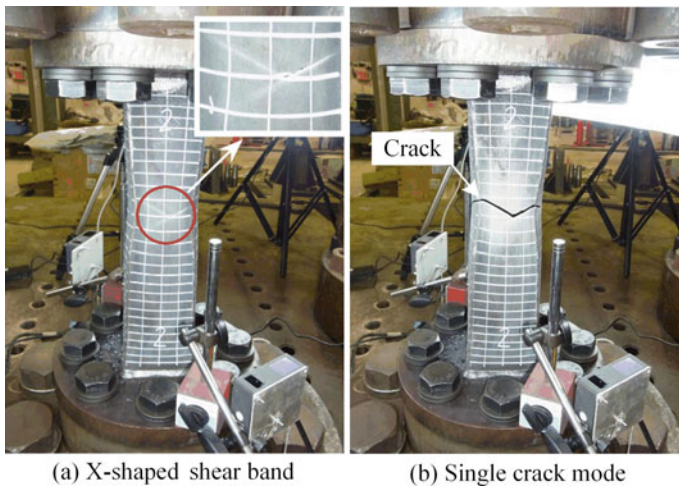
Formation of shear band and single-crack mode of a heat-treated SHS stub column (specimen *RH1-1*)
